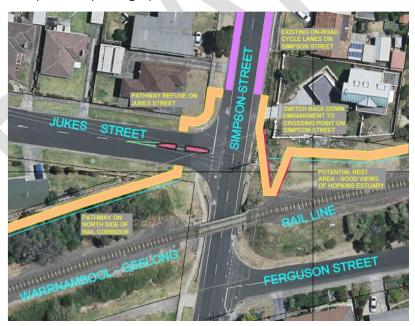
Proposed Rail Trail Crossing of Simpson Street
